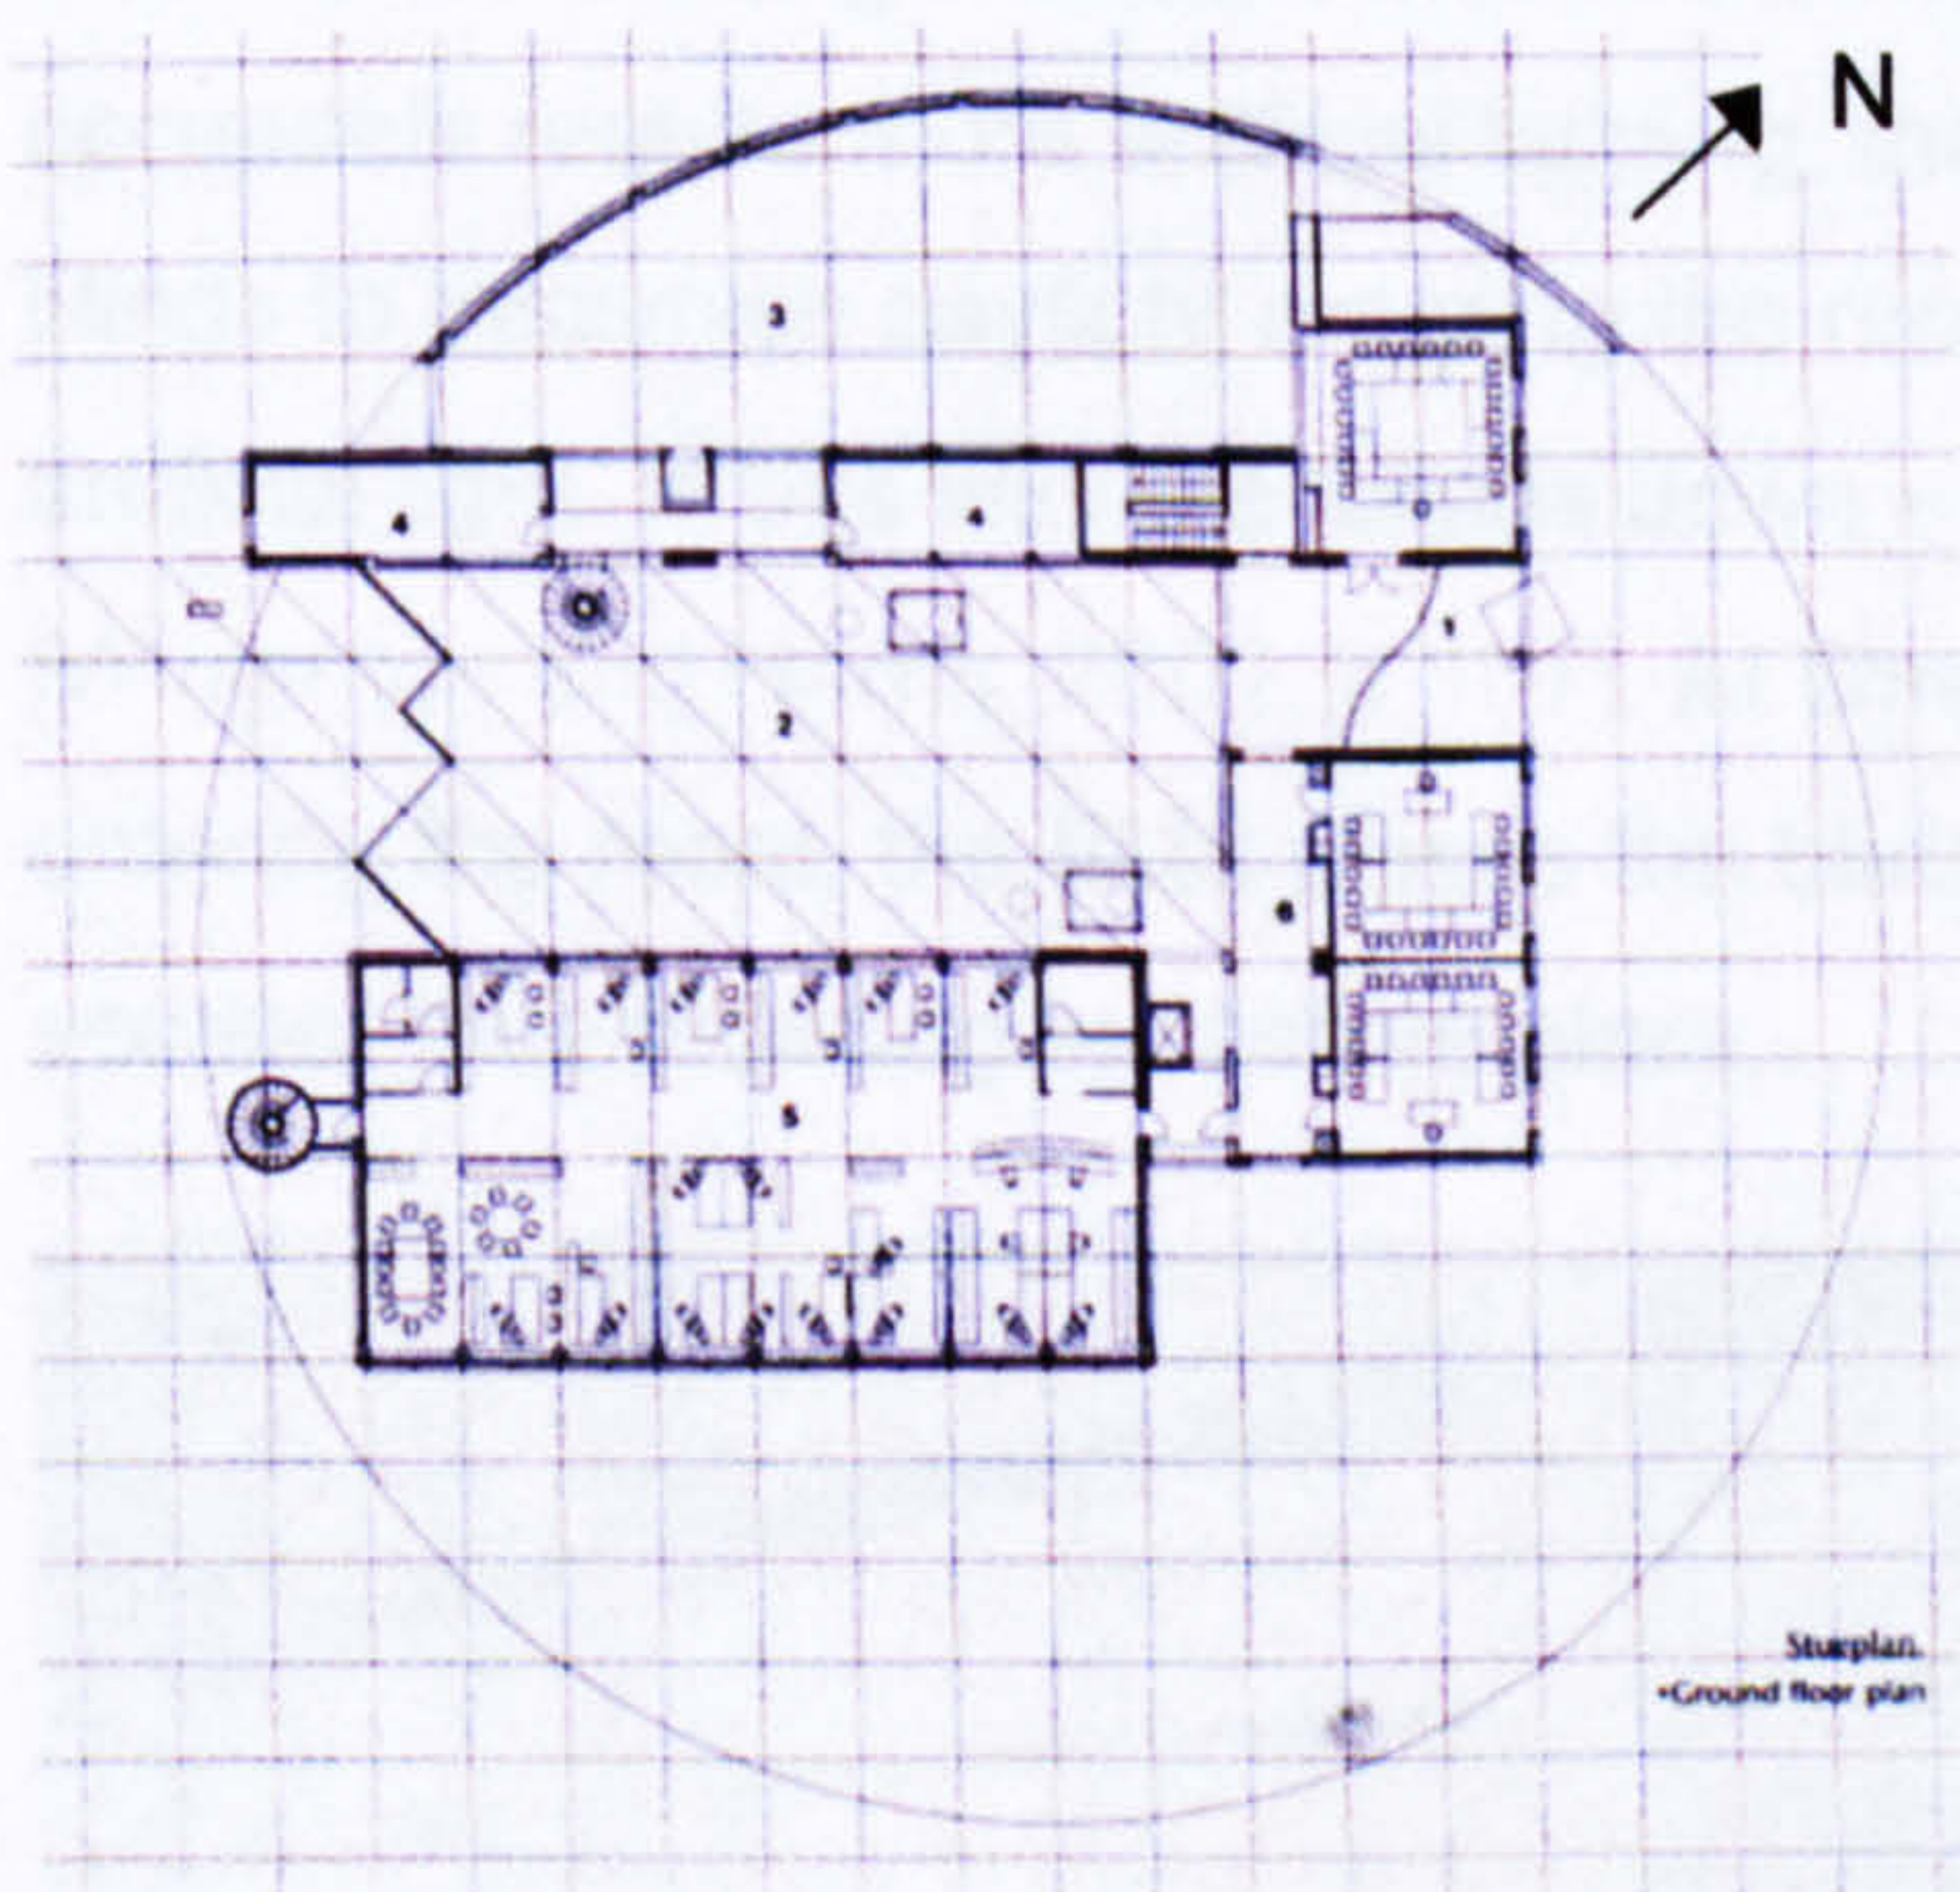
Brundtland Centre, Toftlund, Denmark. Site plan
